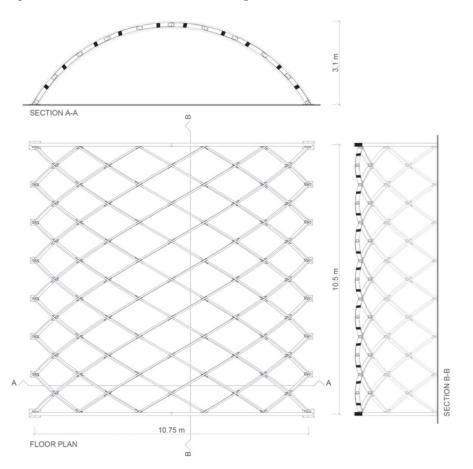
Floor plan and sections of the lamella vault of the physical model.
